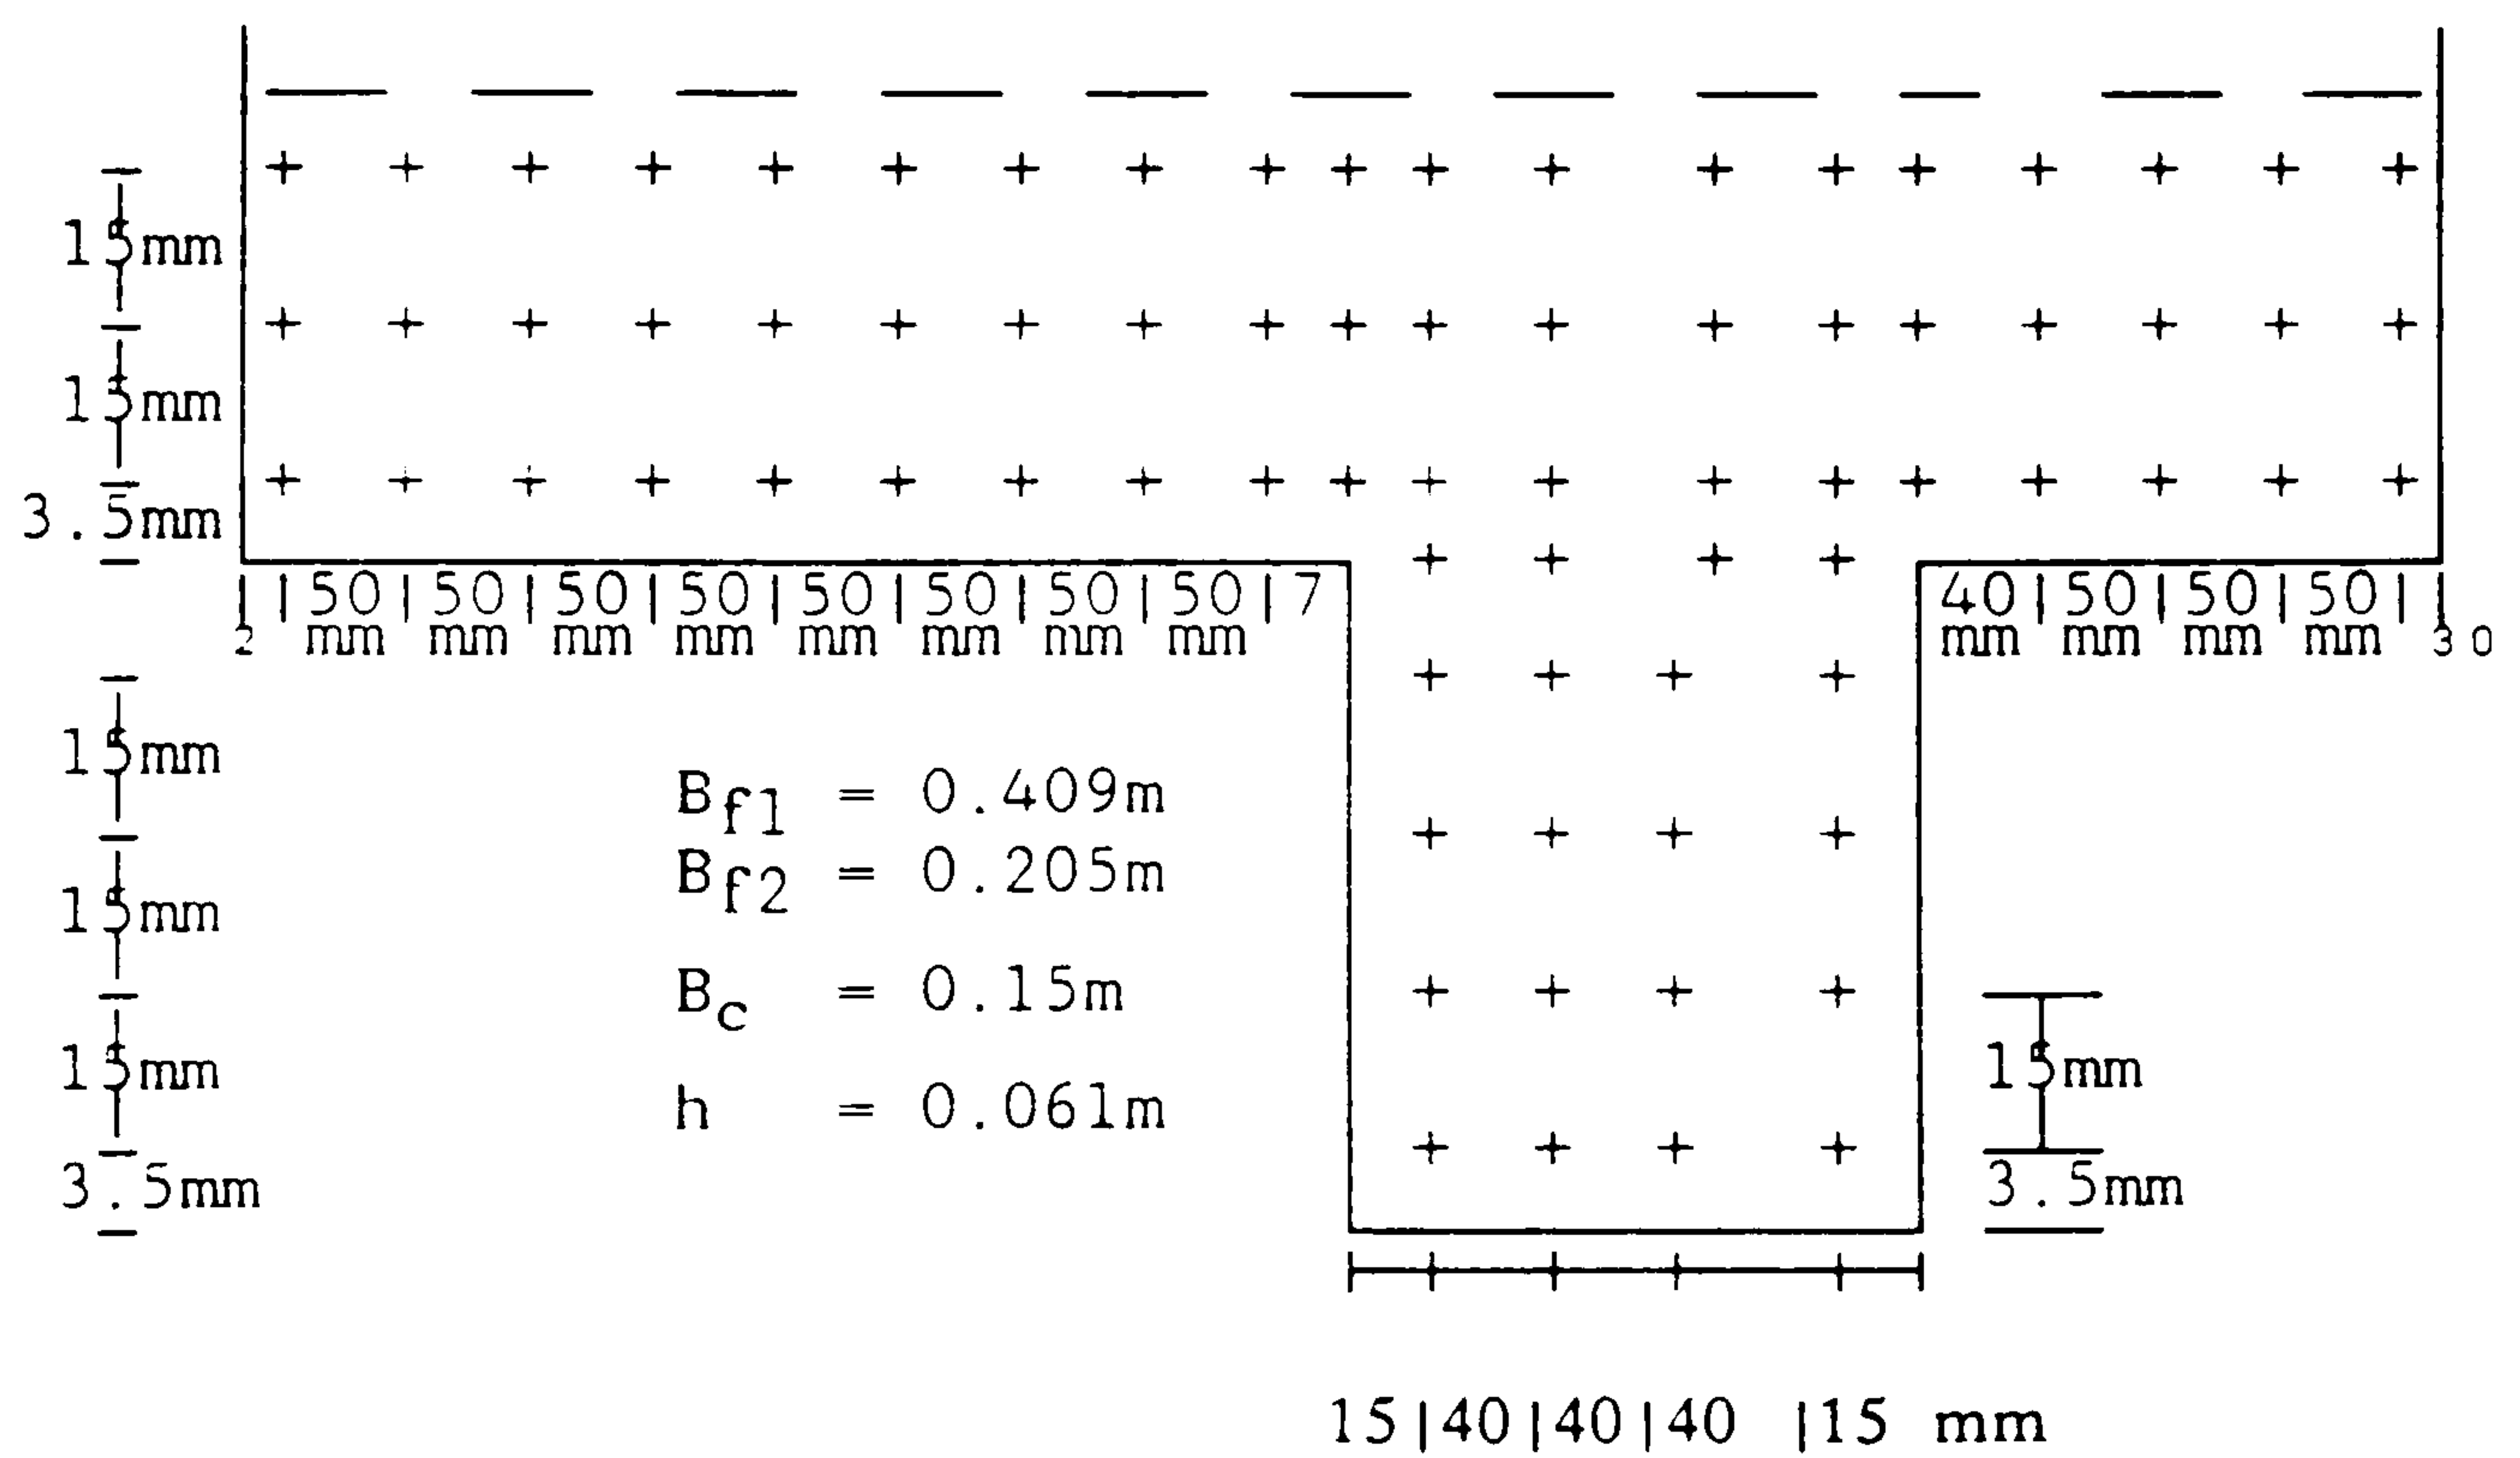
Asymmetrical Cross Section (Section 2)
